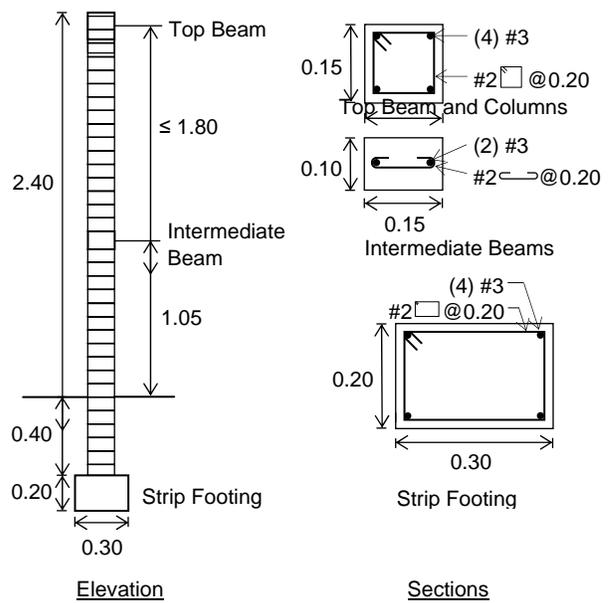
Typical details (reinforcing steel is in in-pound bar sizes; dimensions in meters)
